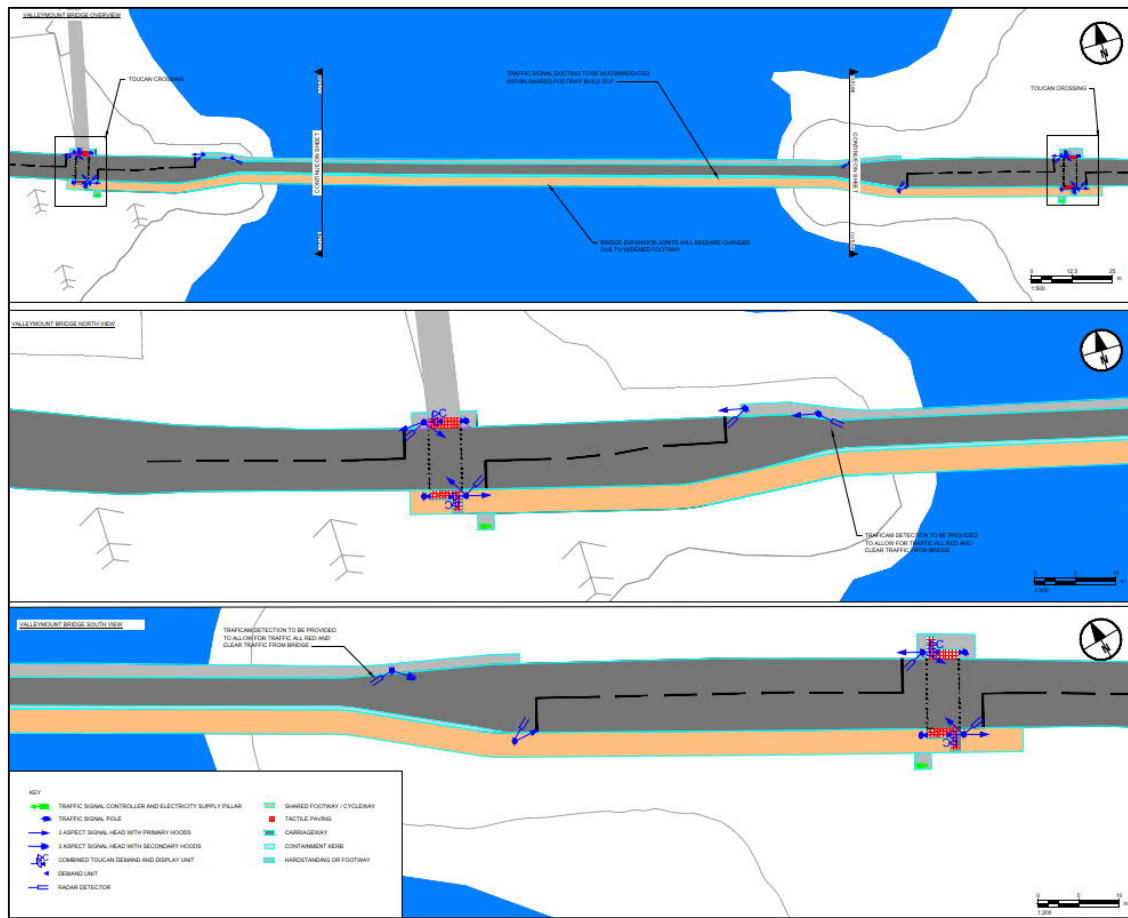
Proposed Shuttle Working Design, Vallemount Bridge
